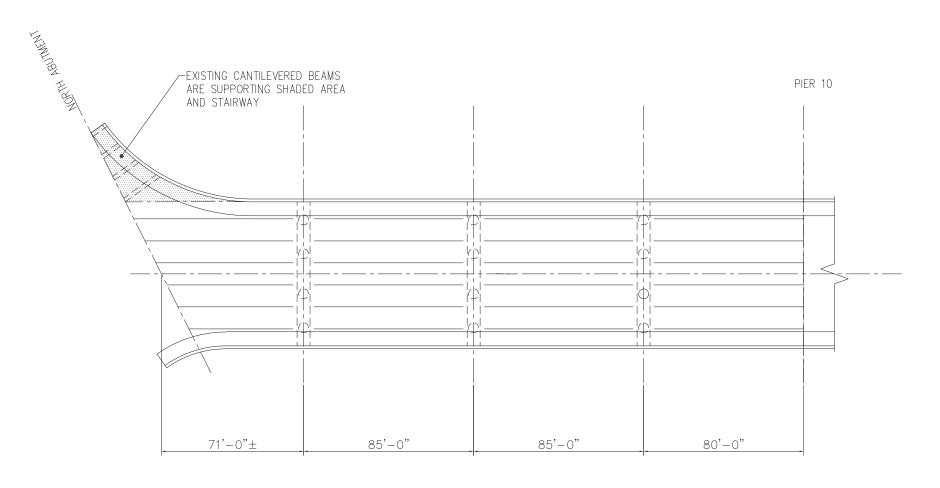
FOUR SPAN STEEL I-GIRDER DECK PLAN
